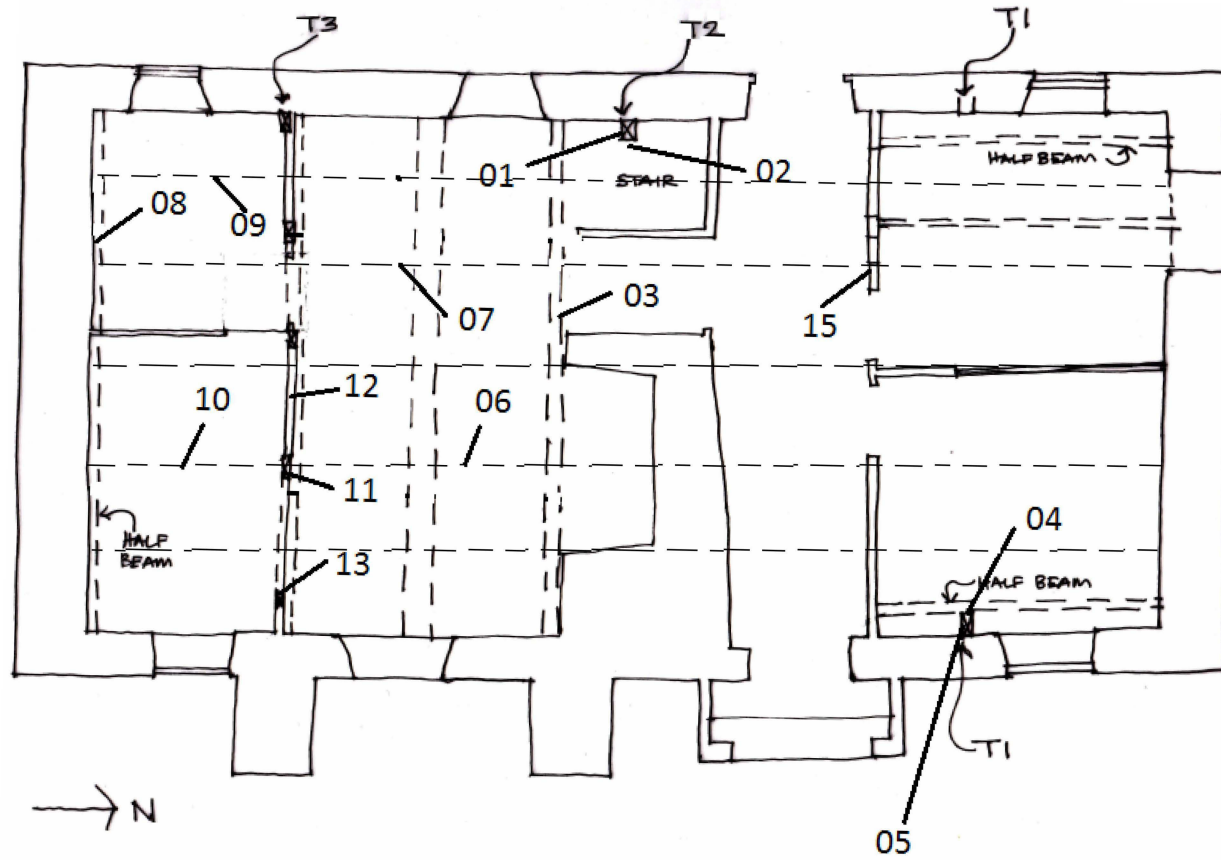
Plan of the farmhouse showing the approximate locations of samples taken for dendrochronology (except sample 14 from a ceiling joist)
